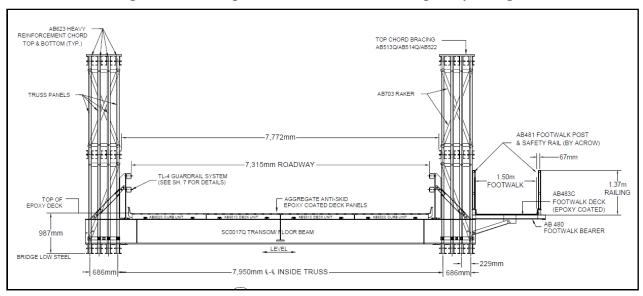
Proposed Deck Section for Temporary Bridge
